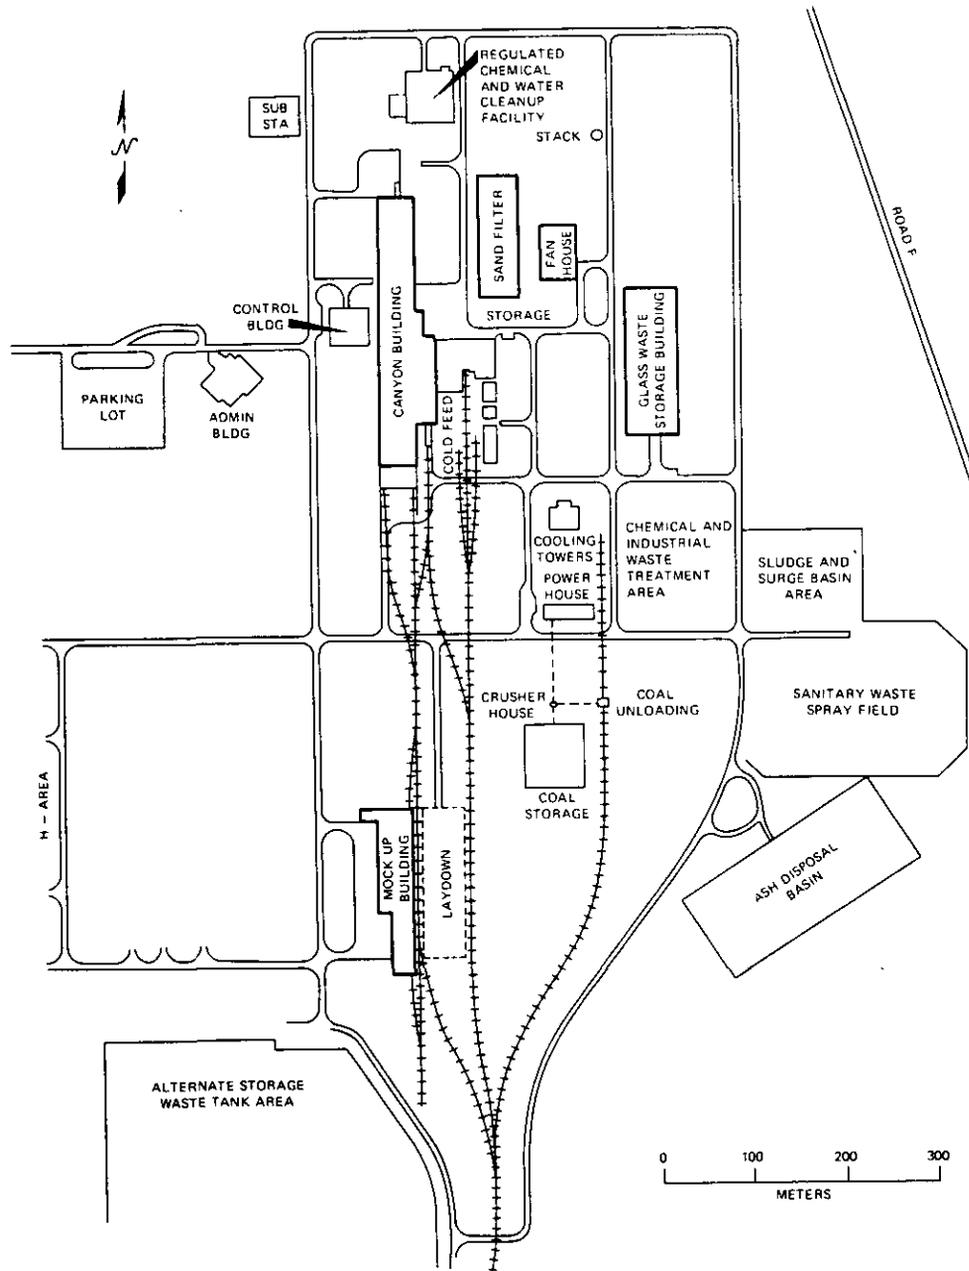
Plot plan of the 200-S area for waste immobilization and interim storage of vitrified waste. Source: EID, Sect. 3.
